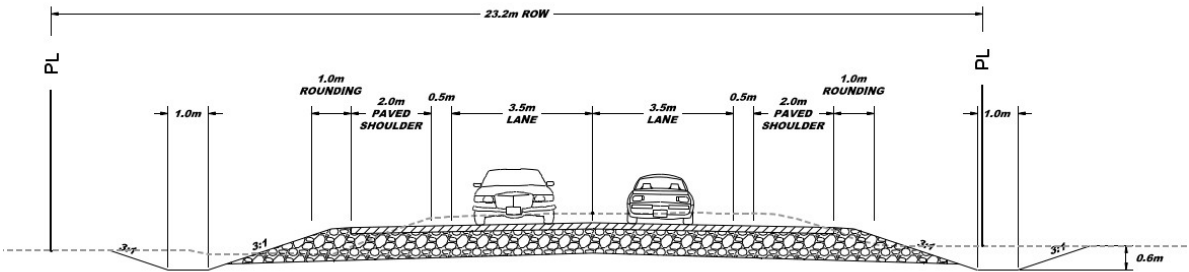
Cross-Section of Roadway Outside the Wetland Area
